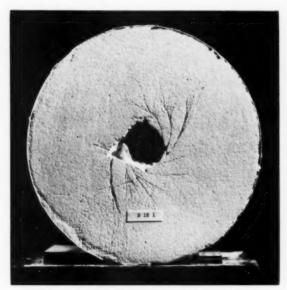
A photograph of model type R-16, which has an opening 1.4 in. round.
